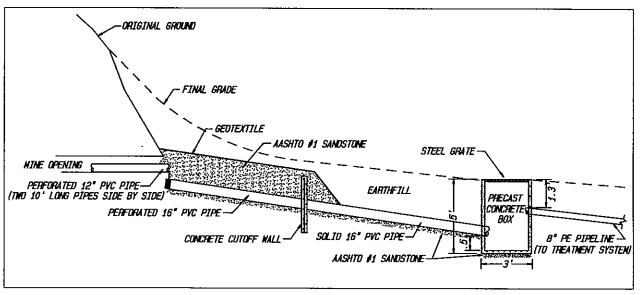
MINE WATER COLLECTION SYSTEM AT OVEN RUN SITE E
